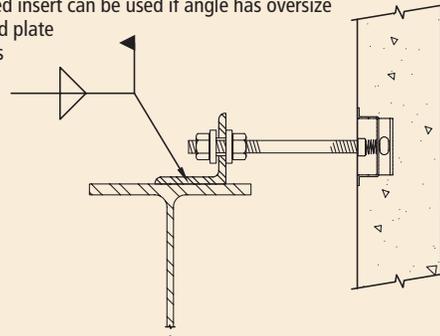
Welded tieback (WTB8).
